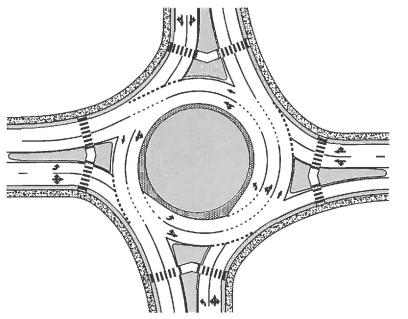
Multilane Major Street with Single Lane on Minor Street
